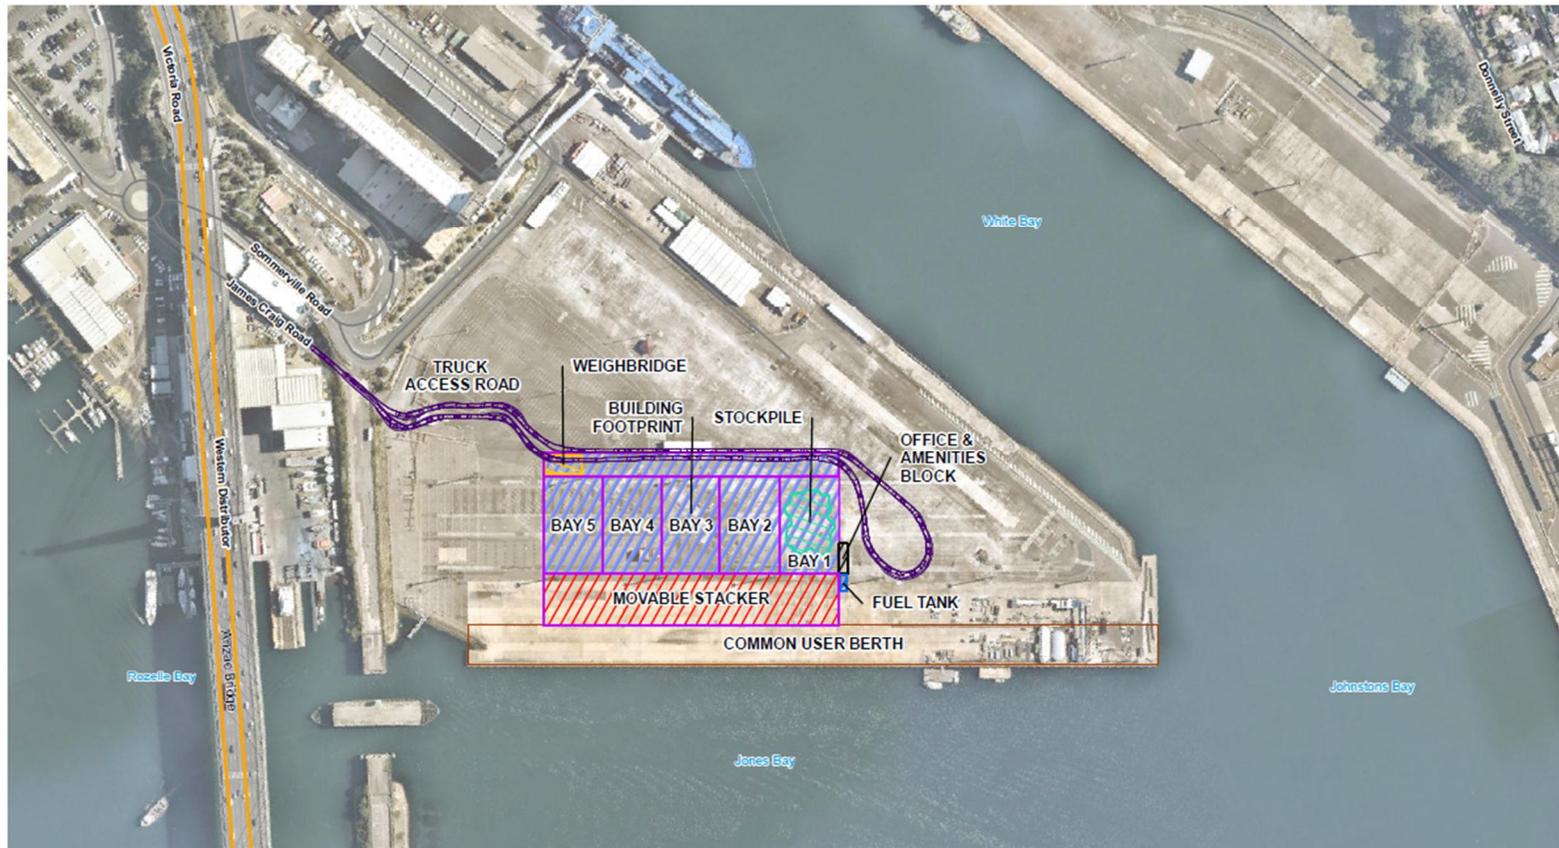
SITE LAYOUT (INDICATIVE)
